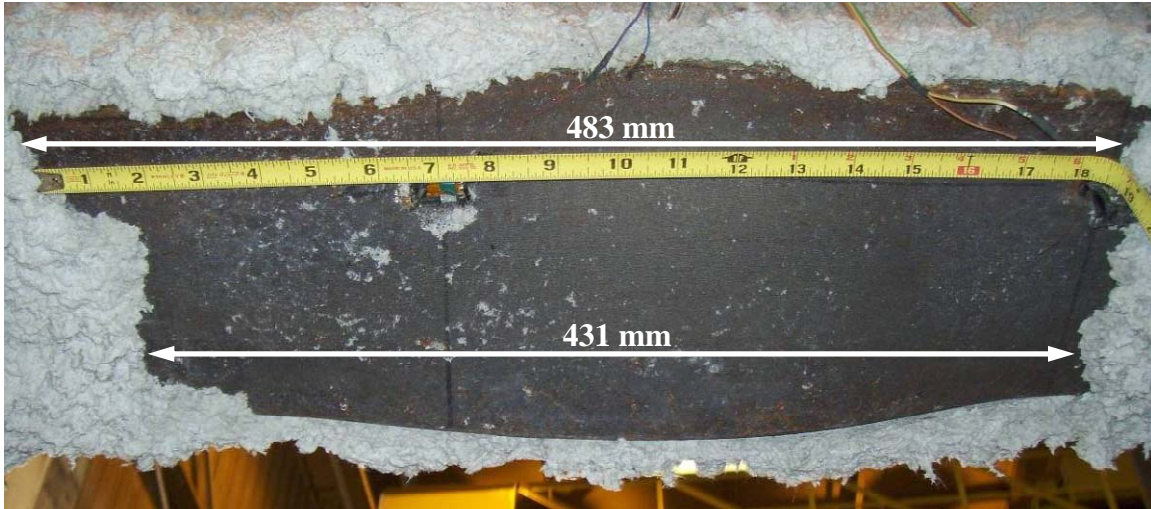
Final section of SFRM on bottom flange of DM assemblage during post-testing inspection
